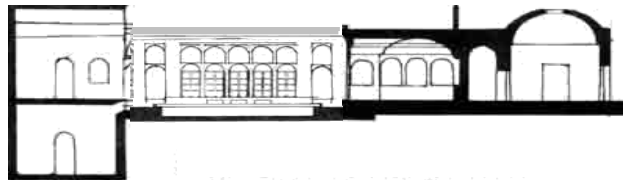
Cross-section of a typical traditional house in Yazd (MHUD, 2006)
